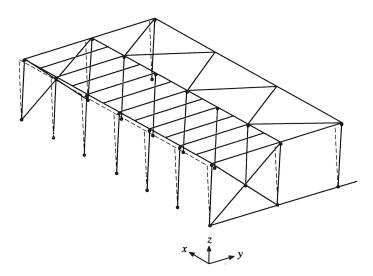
Transfer of P- Δ forces from inclined columns through roof and wall bracing.
